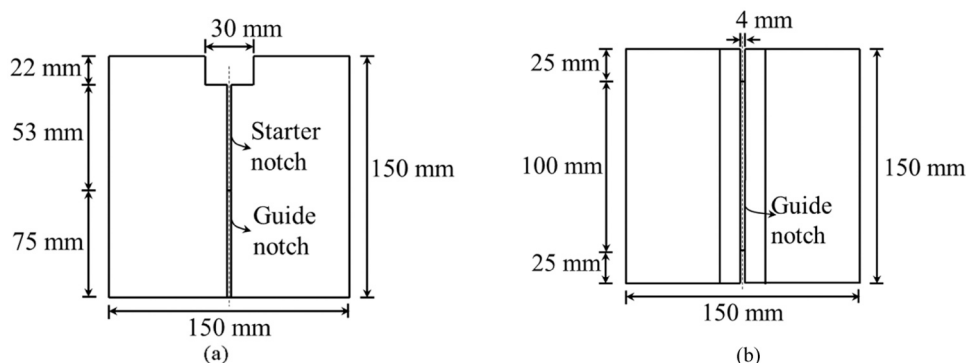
Illustration of the specimens' geometry: front view (a); top view (b) as per NT BUILD 511 [46].
